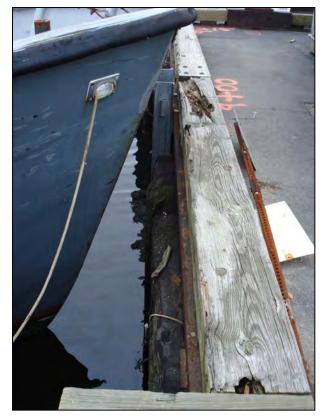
Older fender system with rotted timber curb and damaged chocks.
